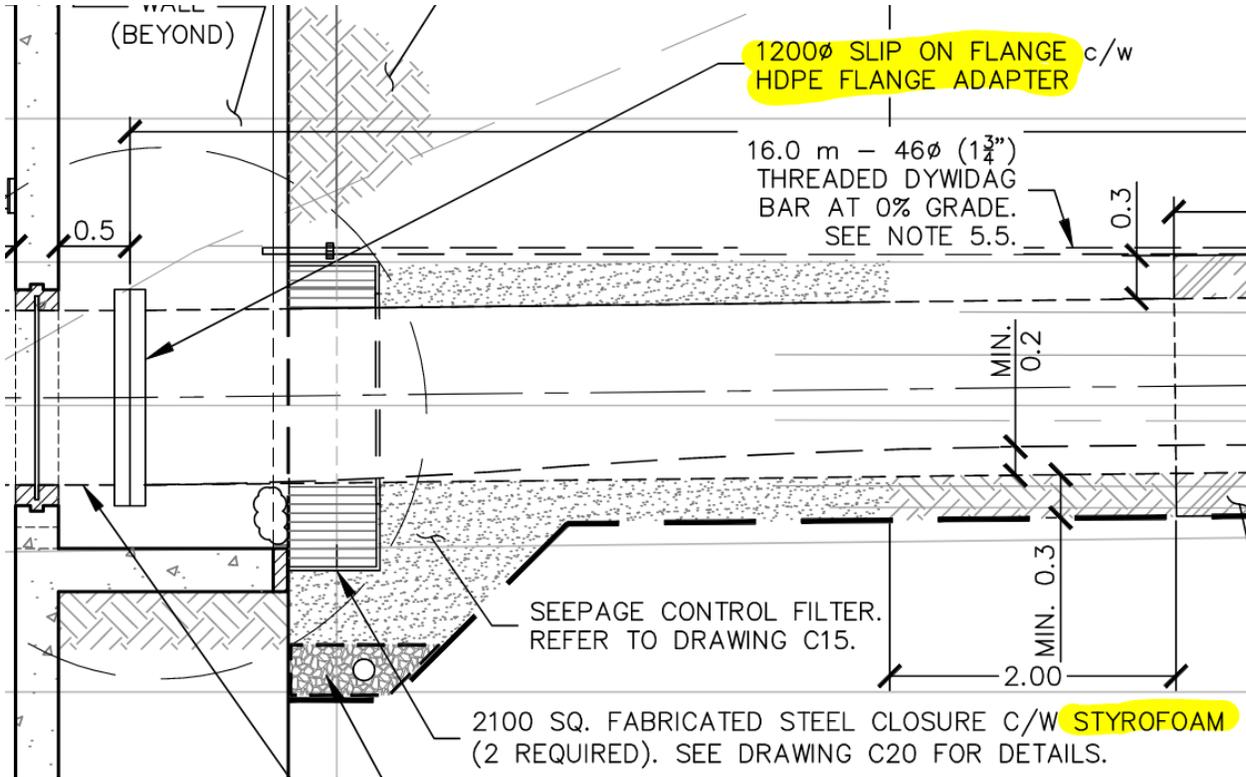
Screenshot of transition from steel pipe (left of flange) to HDPE pipe (right of flange) and styrofoam gasket through which the HDPE pipe passes through at the sheet pile wall (USL drawing C10 R.1, 2022.05.06)
